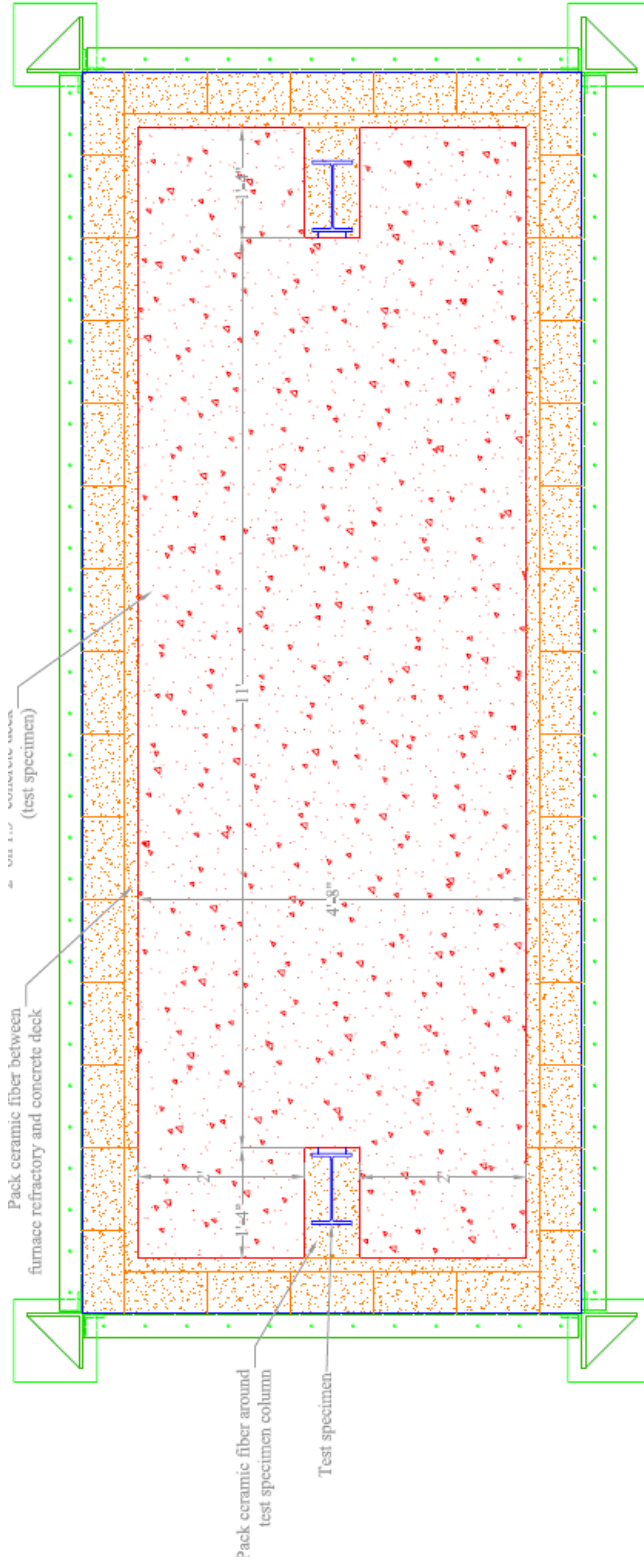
Top view of assembled furnace (Catella, 2008)
